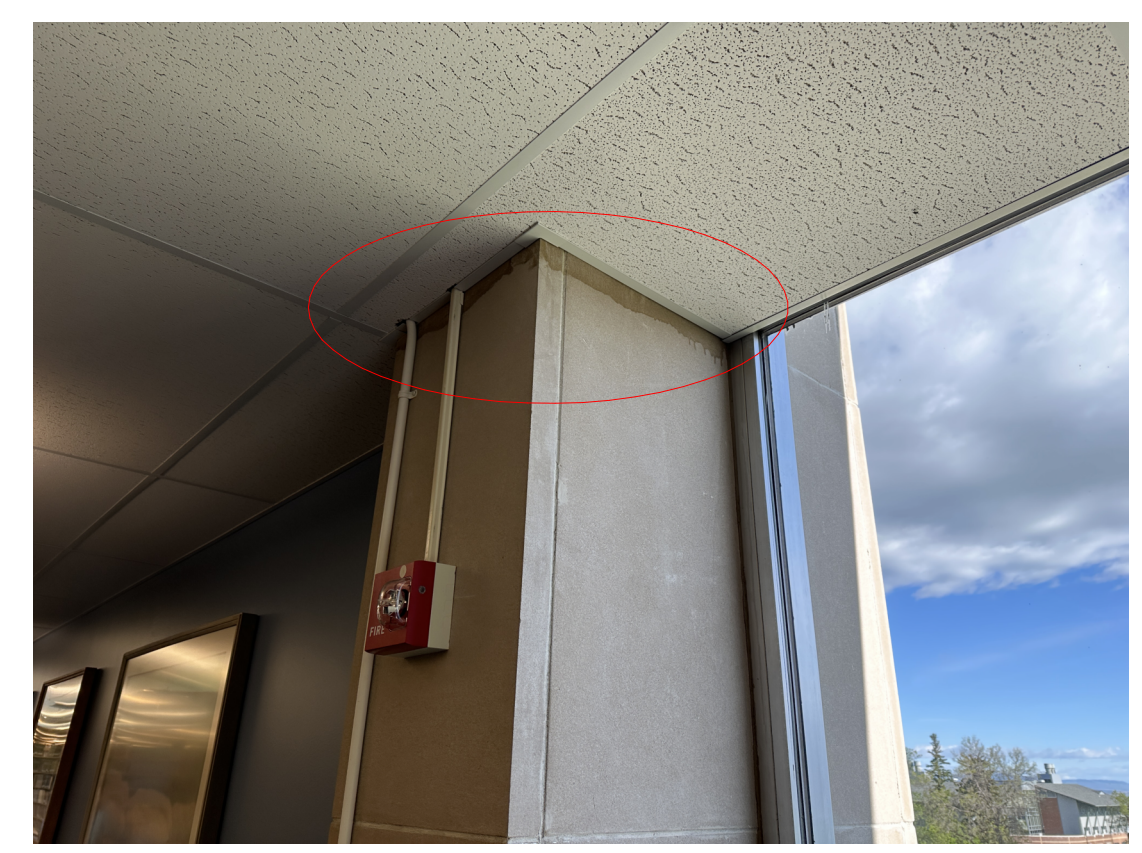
PHOTO OF STAINING AT TOP OF PRECAST COLUMNS, TYP.
